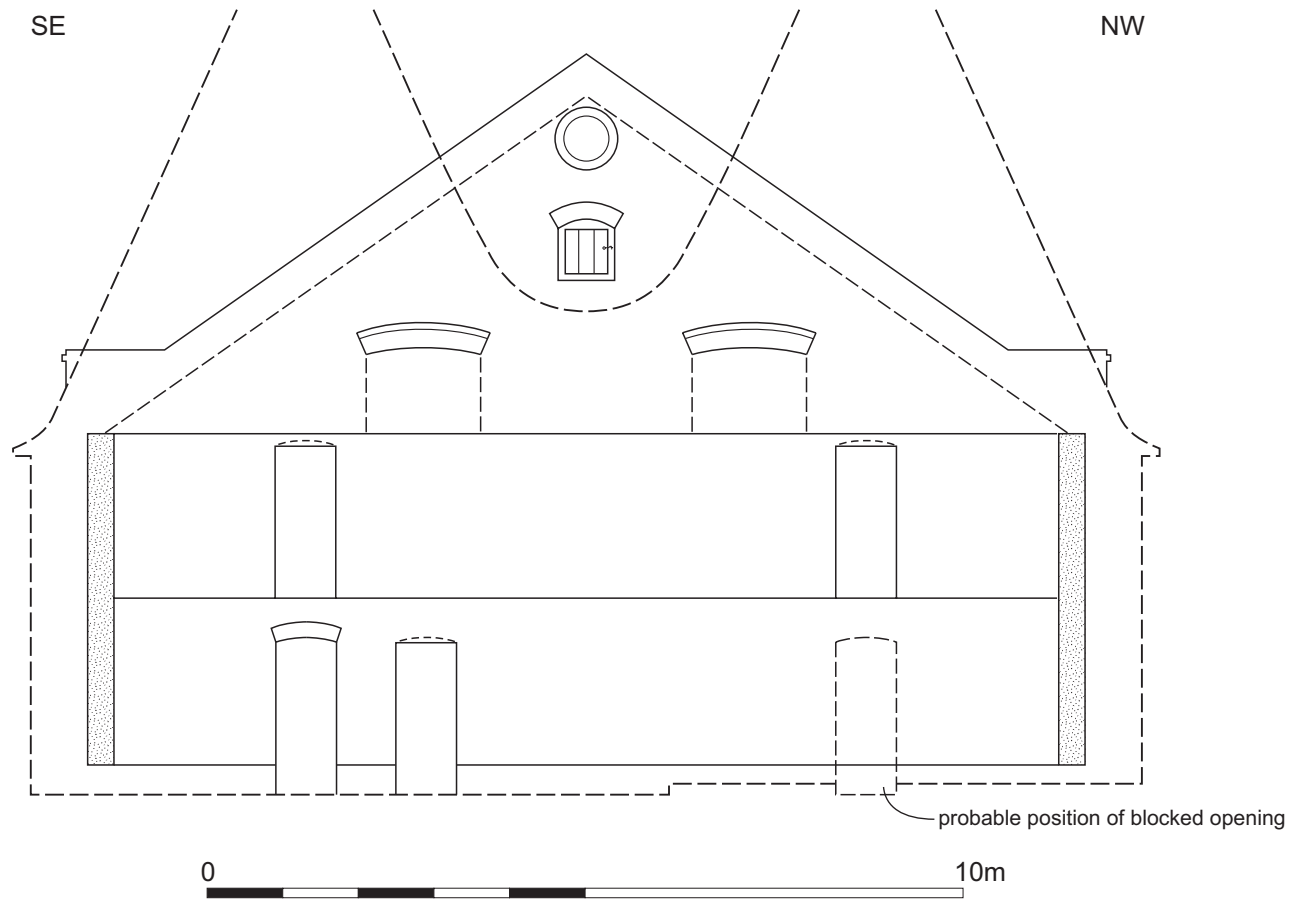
Elevation of south-west gable showing openings into kiln towers. Scale 1:100
